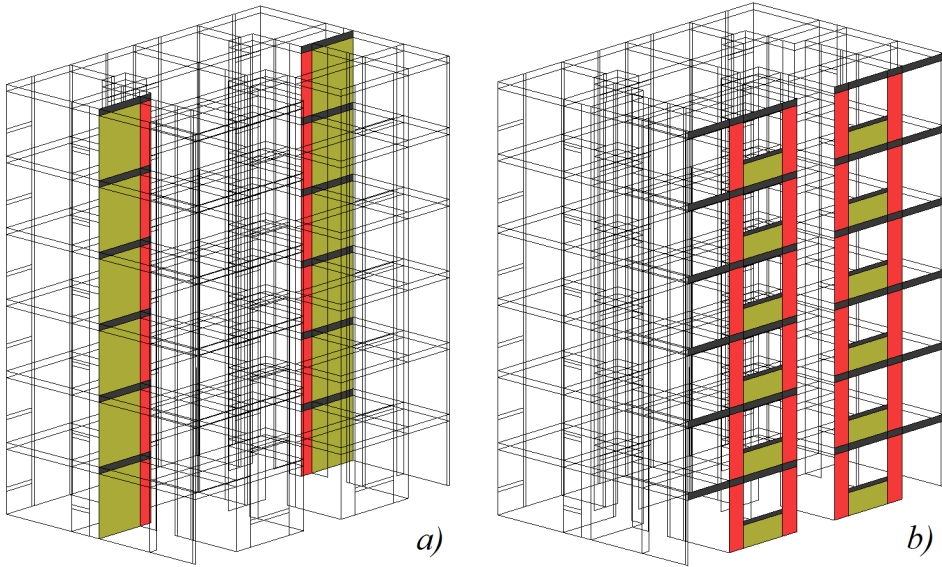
View of constructive axis 4 and 7 of GiD model for the B-SSC building.
